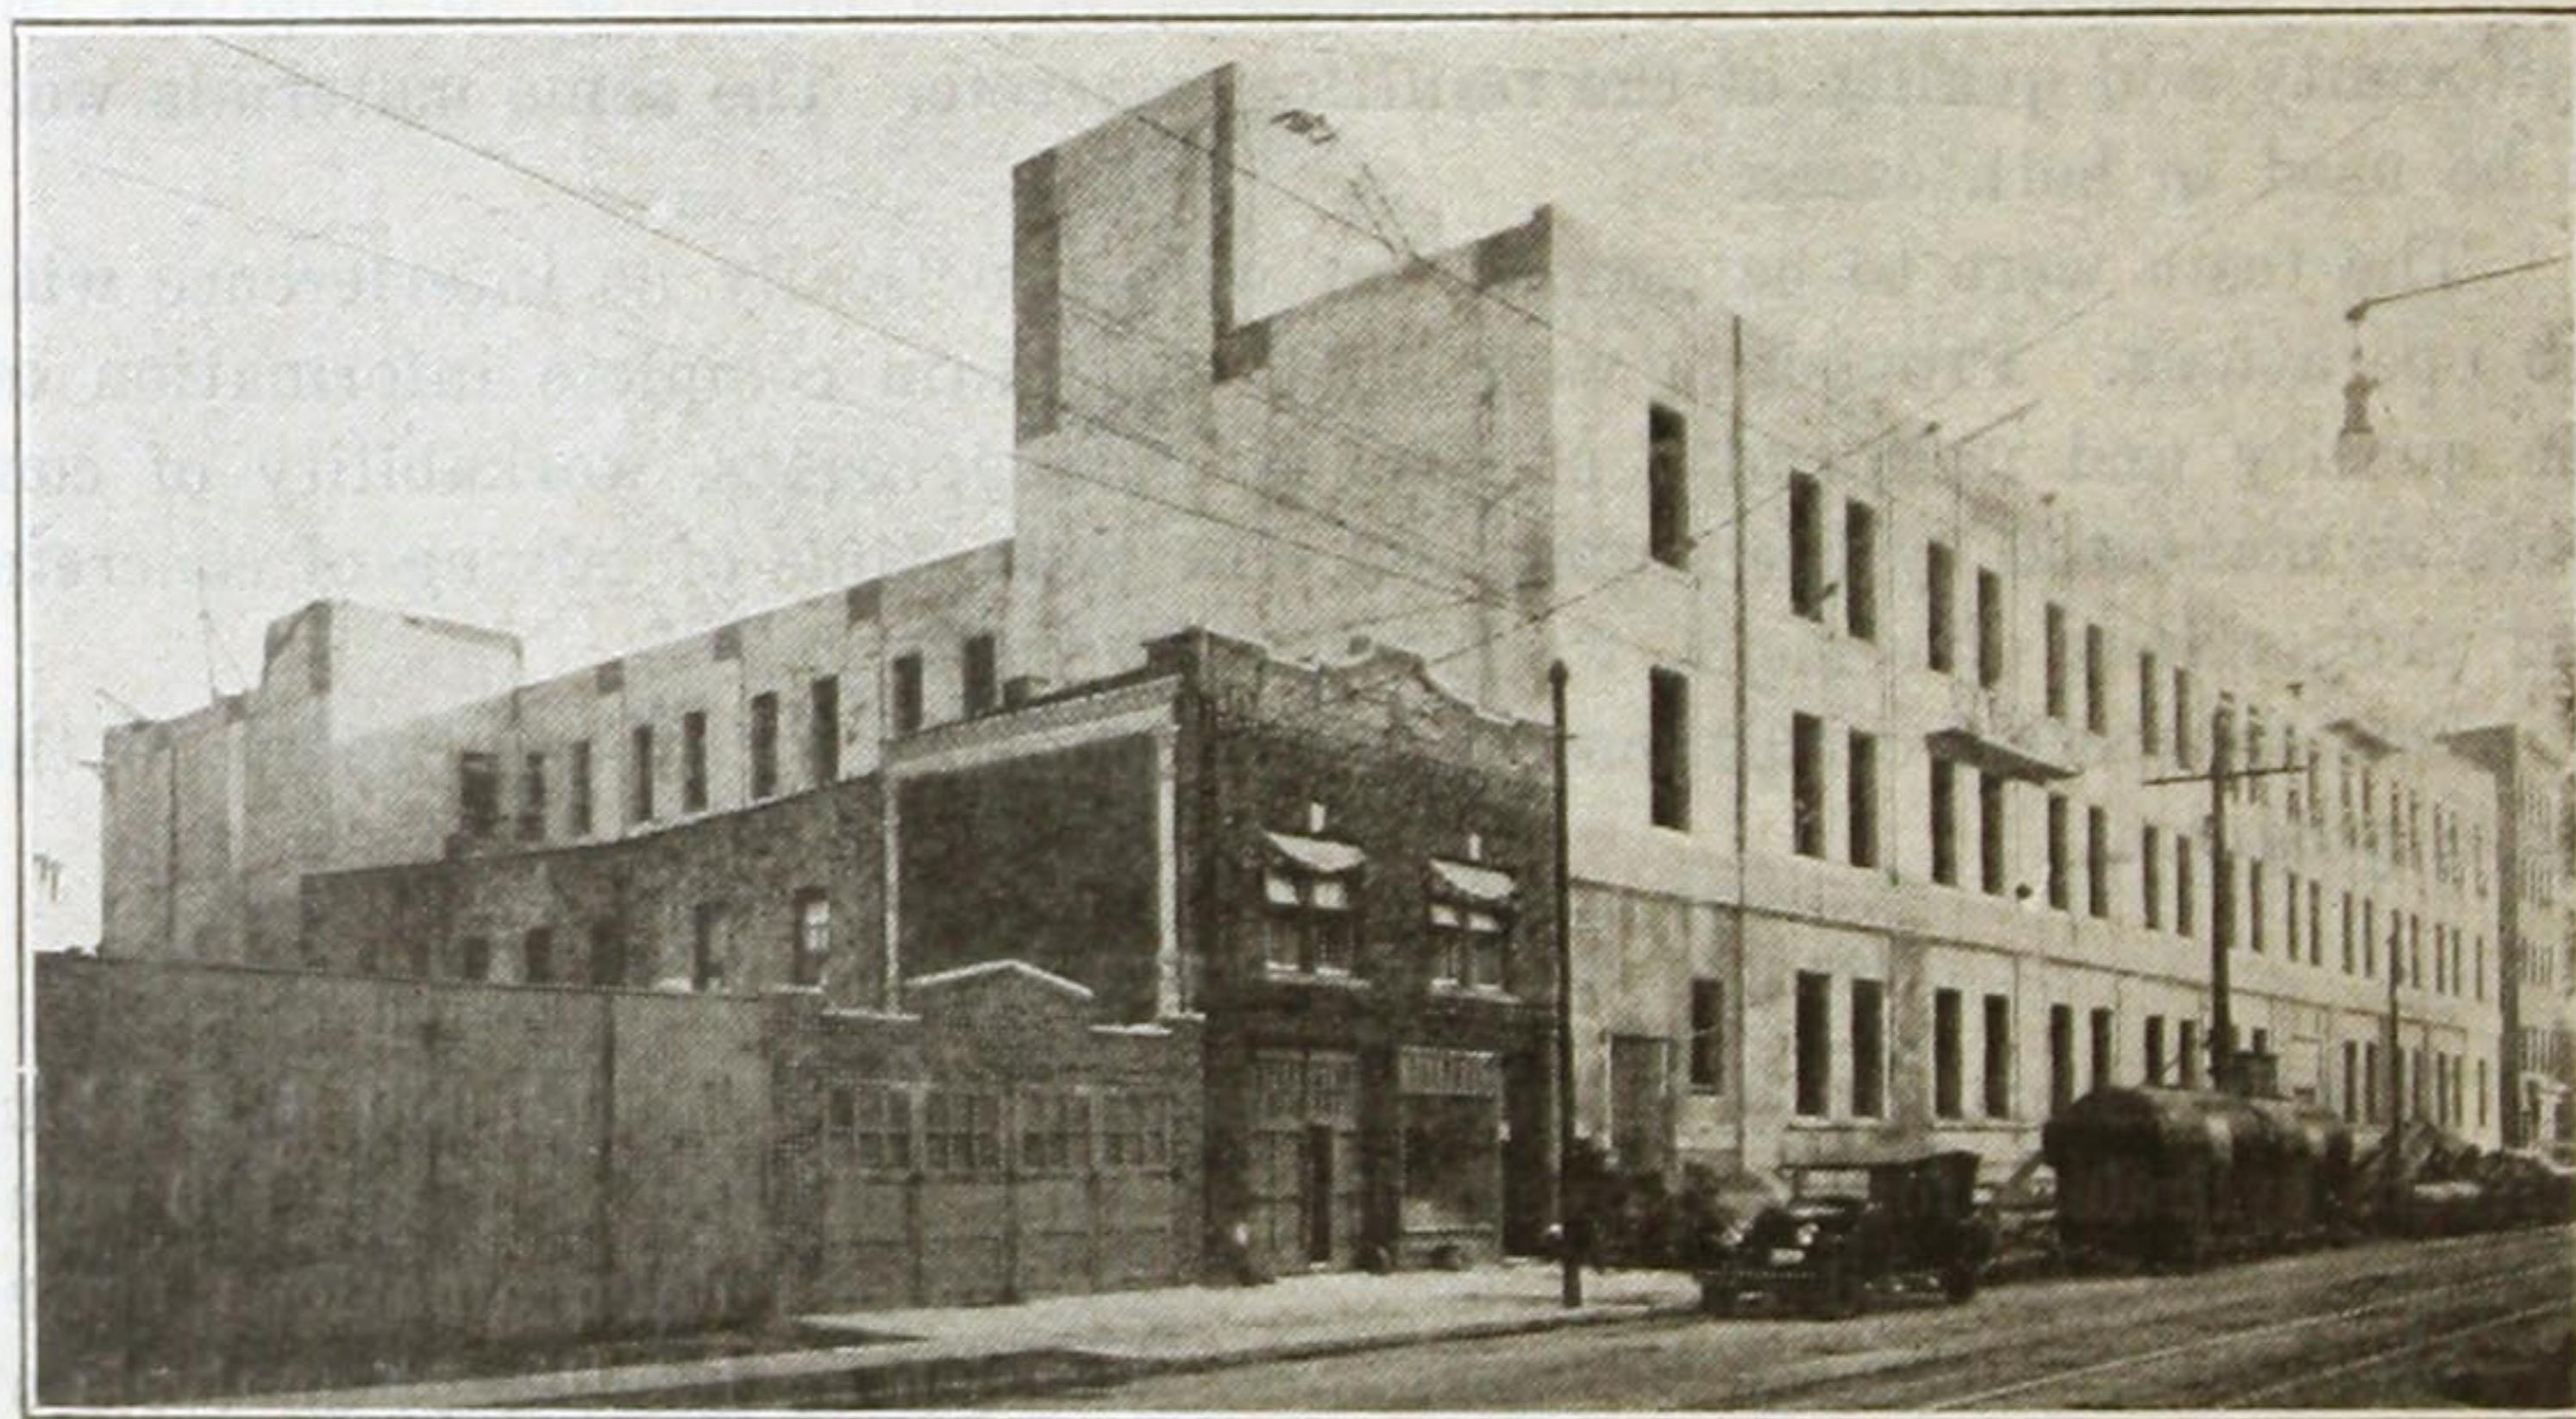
"JOB A" AFTER CONCRETING WAS FINISHED.
